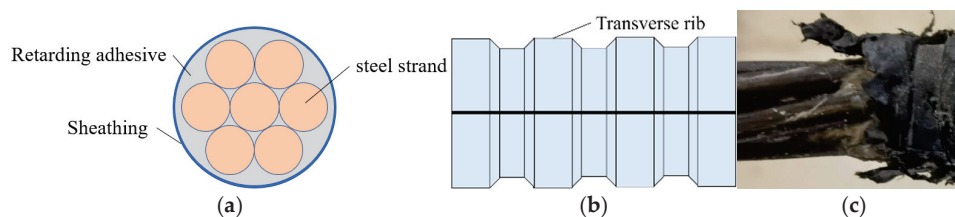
Details of retard-bonded prestressing steel strand: (a) cross-section; (b) external appearance; (c) photo.
